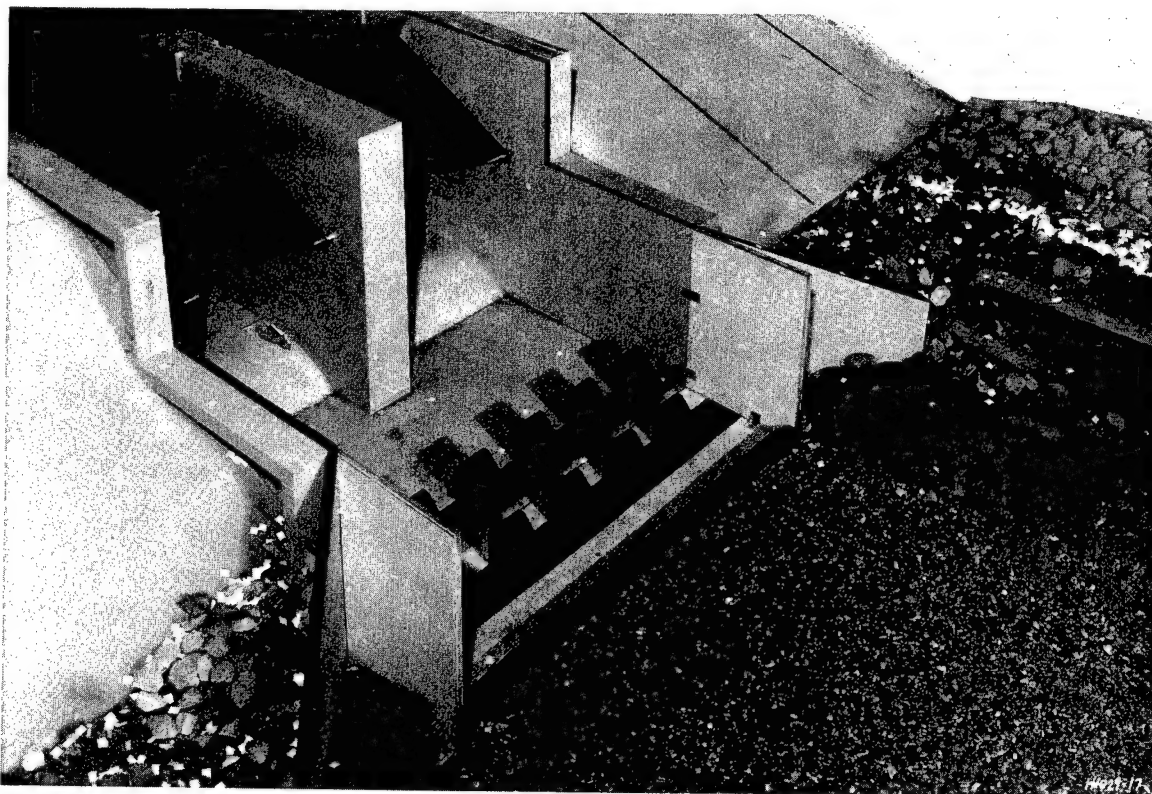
Type 3 design, stilling basin and sidewalls extended 6 m (20 ft)
